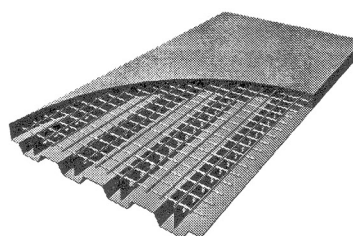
Steel-concrete composite deck with profiled steel sheeting
